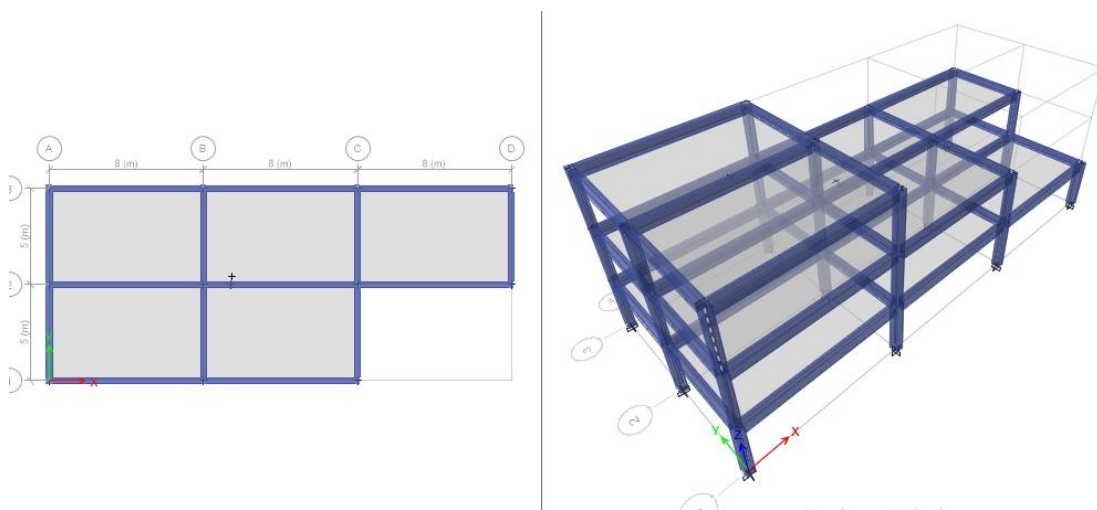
Second story plan and 3D of 3 story irregular rcc building
